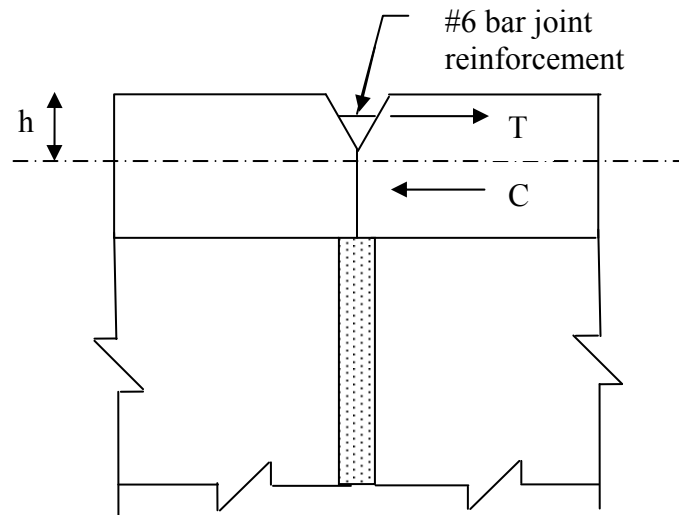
Tension and compression force diagram for uncracked deck section
